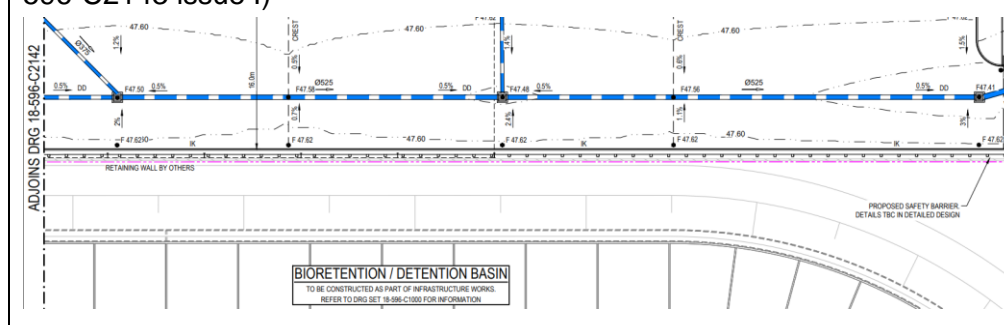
Applicant's On-Lot Works Landscape plan – Warehouse 1 – Excerpt.
